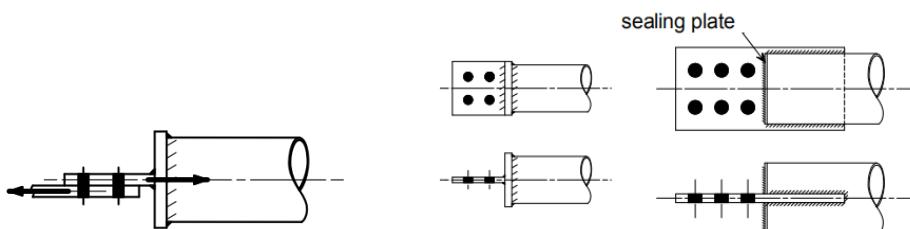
Connections details (Left: Gusset connection Right: End plate connection). Retrieved from “Joints in Steel Construction – Simple Joints to Eurocode 3” by The Steel Construction Institute (pp. 258-259), 2014.
